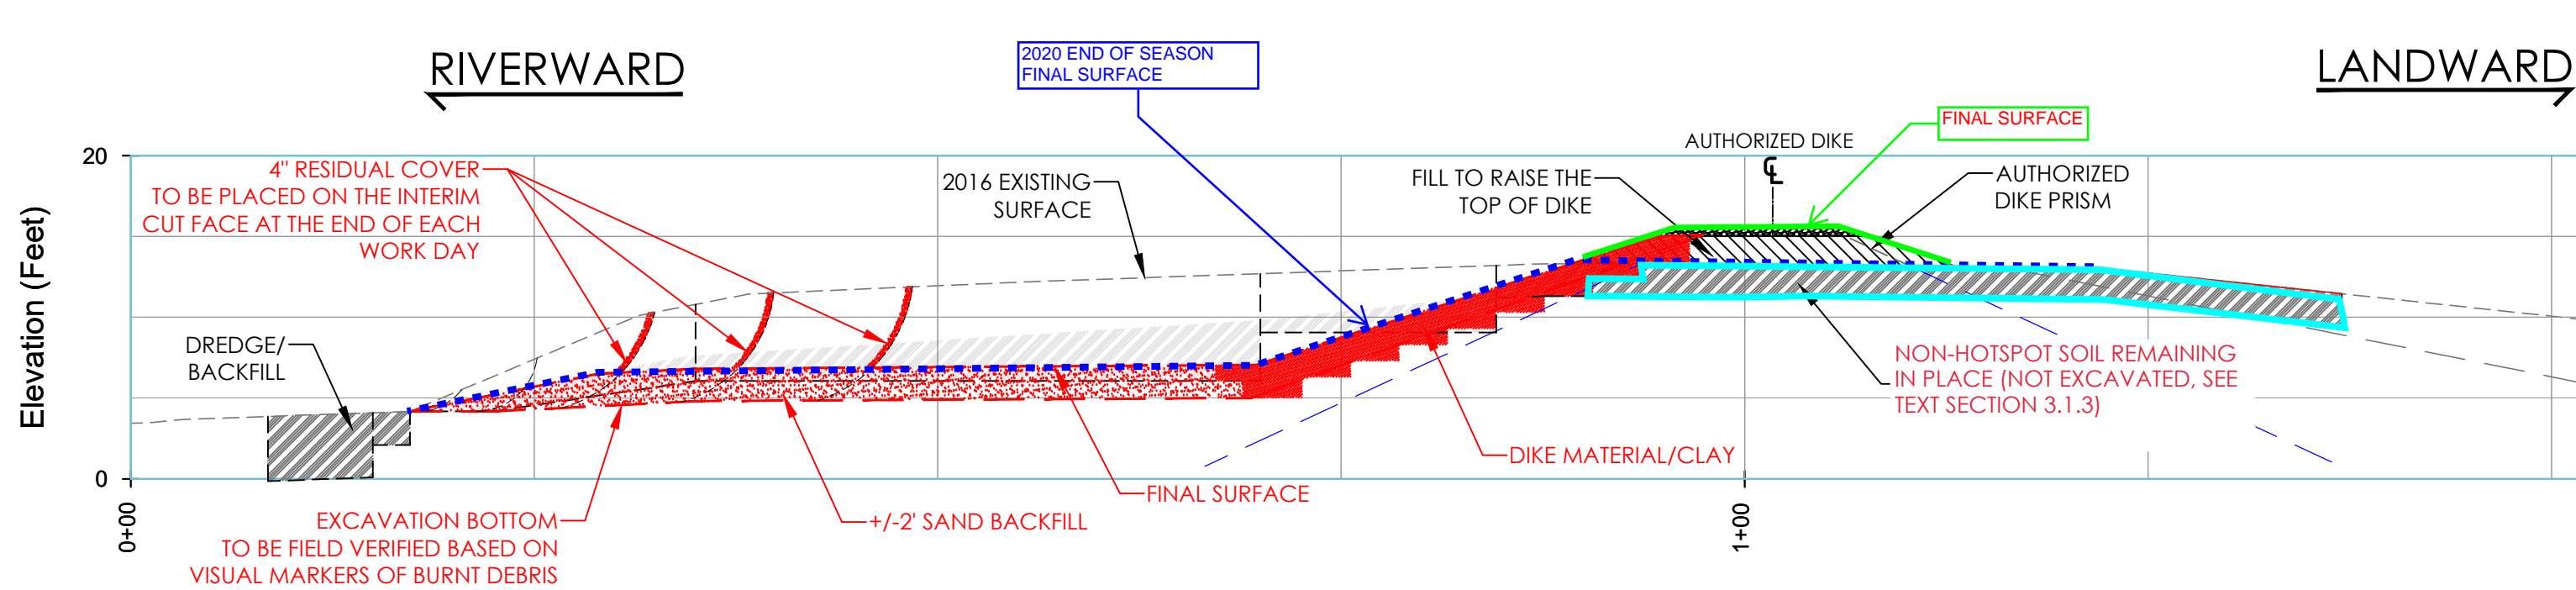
BURN PIT EXCAVATION DETAIL
